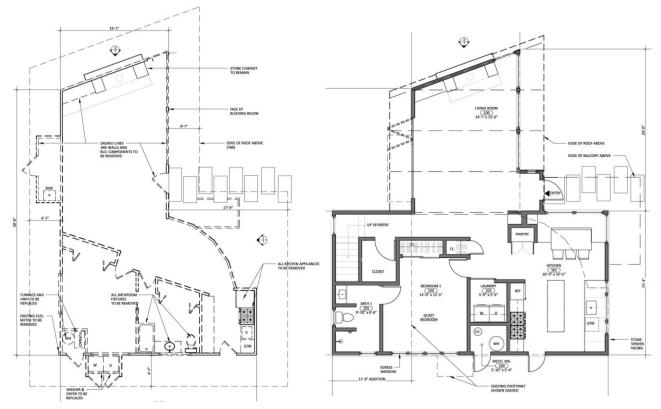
Floor Plan: The existing first floor plan is on the left and the proposed first floor plan is on the right for the remodel of the single-family dwelling at 255 Highway 1 in Carmel. (Source 1)
